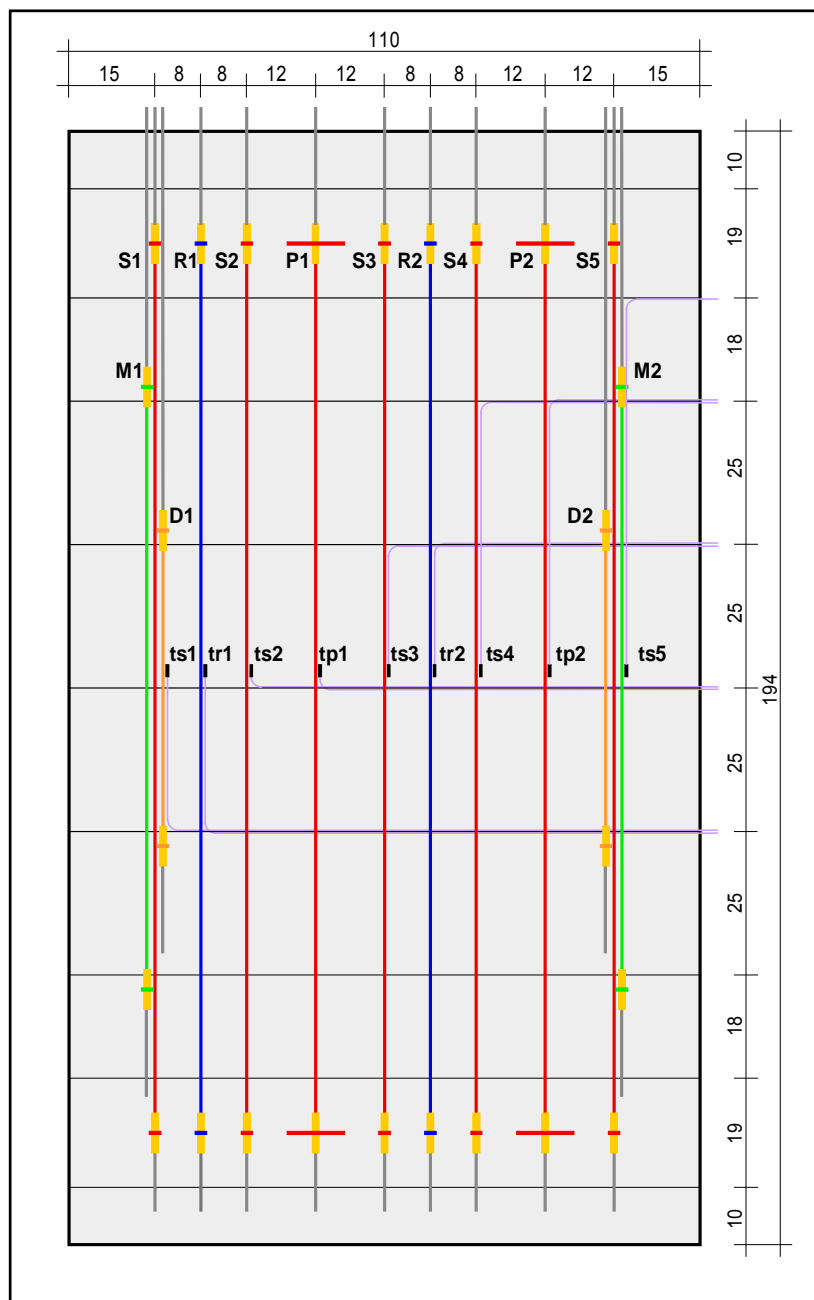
Vertical view to sensor position in concrete slab
